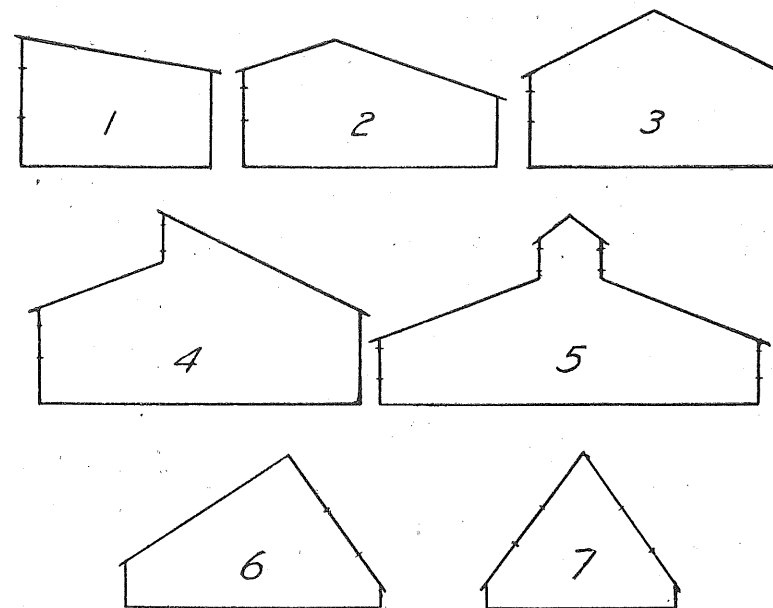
Different types of roofs used in poultry houses are here shown. 1 is a shed roof; 2 a combination roof; 3 a gable roof; 4 a semi-monitor roof; 5 a monitor roof; 6 a slanting front roof; and 7 an A type roof.
